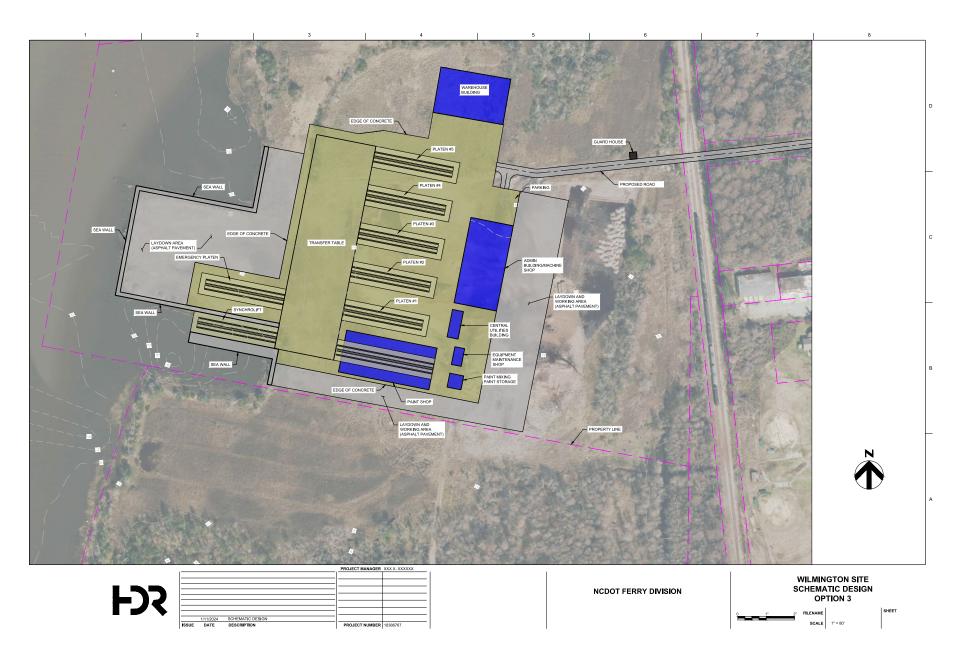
Conceptual Plan for New Maintenance Facility at Wilmington, NC Site
